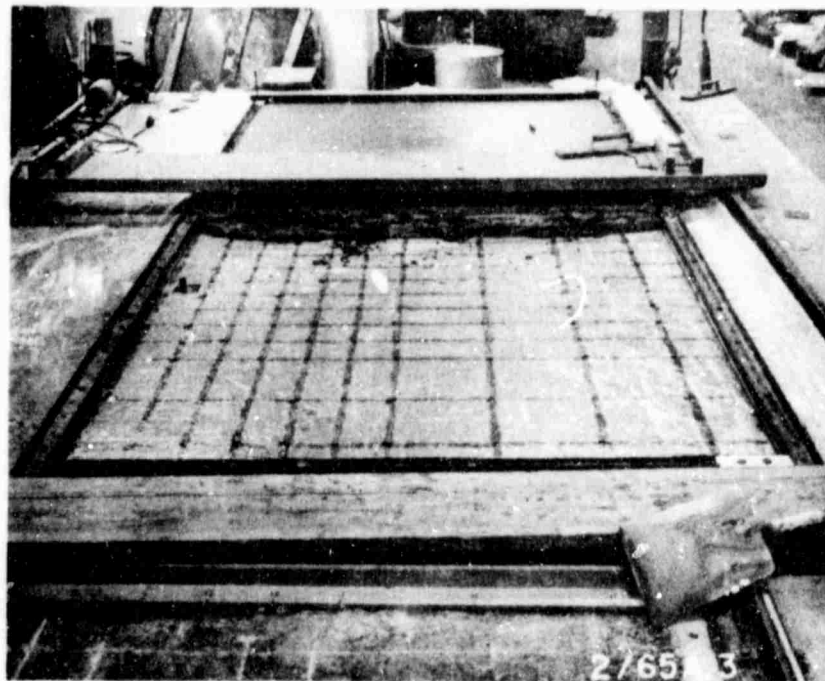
Concrete placement approximately one half complete (All crack alarm grid wires have been coated with epoxy resin.)
